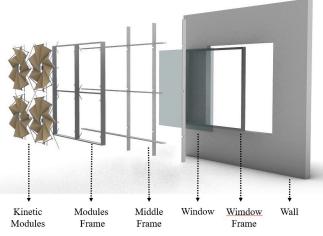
Details of connection the modules of designed kinetic facade to the wall.
